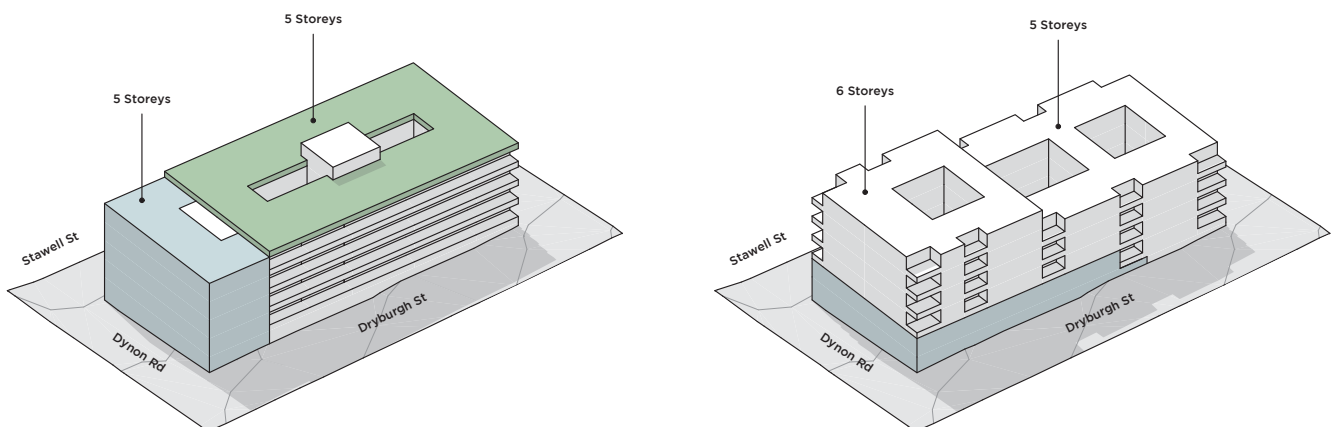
Built form testing to show the proposed floor area ratio and built form controls on a large corner site in Station Precinct (DDO28). Images are indicative only to test the proposed controls and are not representative of actual building proposals (West Melbourne Built Form Testing, Breathe Architecture).
